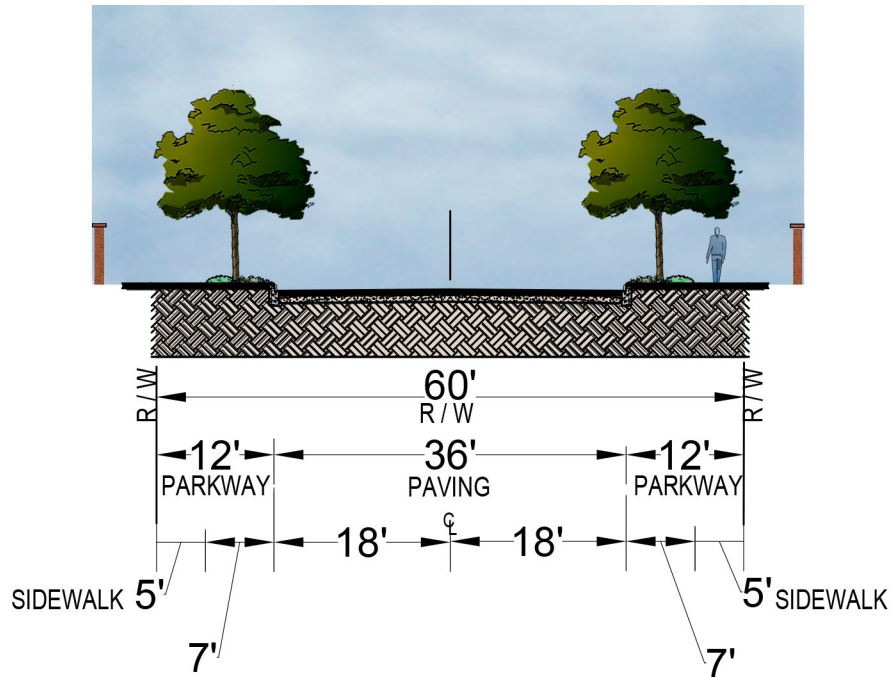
STREET "AA" AND CARPENTER AVENUE SECTION/PLAN
